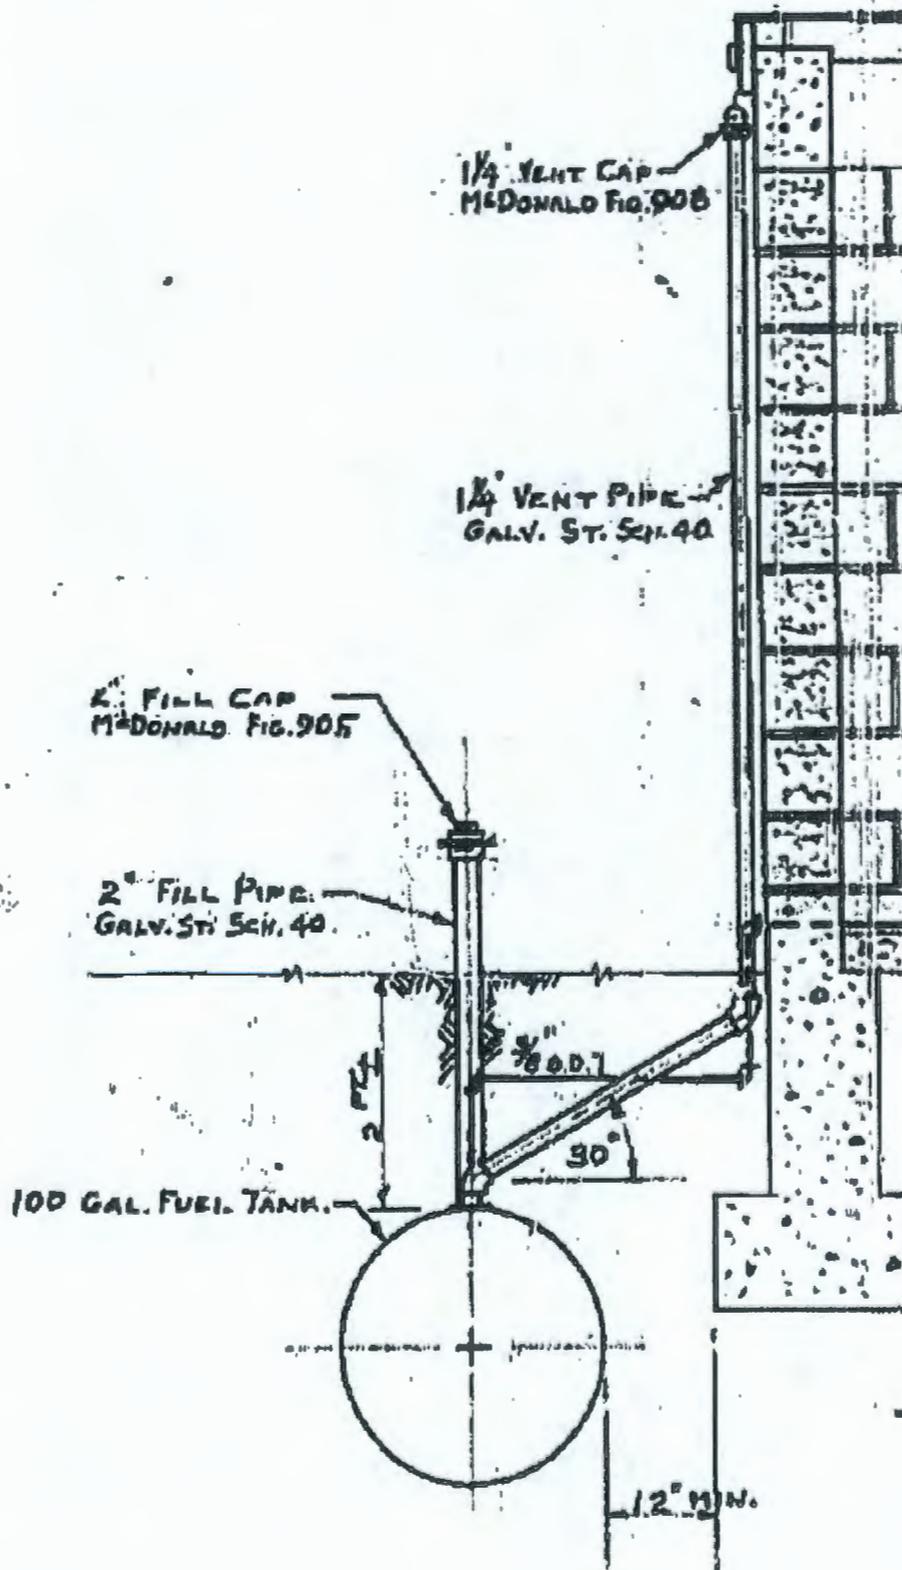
Drawing H-5-548 Partial – Plan View of 600-378 with Connection to the Emergency Generator Building.
